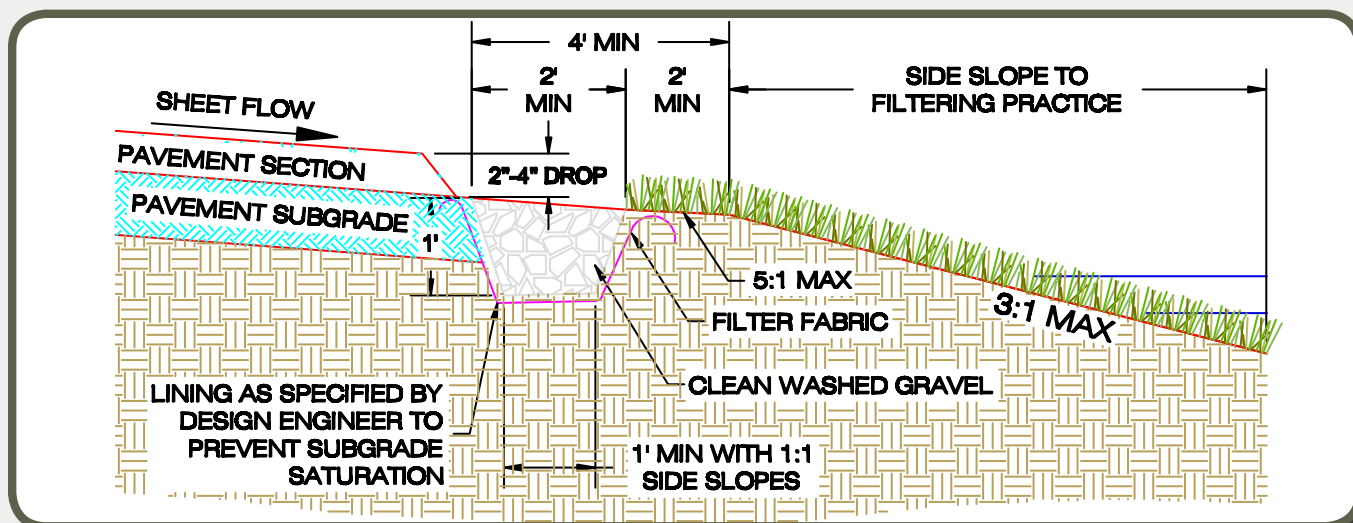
Typical Detail for Pre-Treatment at Pavement Edge – A 2 to 4 inch drop from the pavement to the top of stone helps to prevent clogging.
